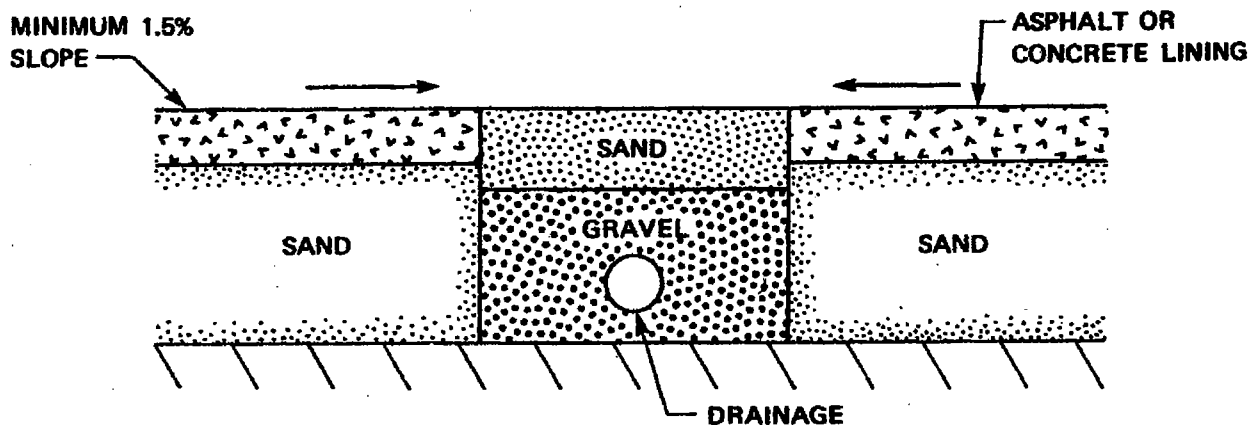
Typical Paved Drying Bed Construction (from Ref. 1).
